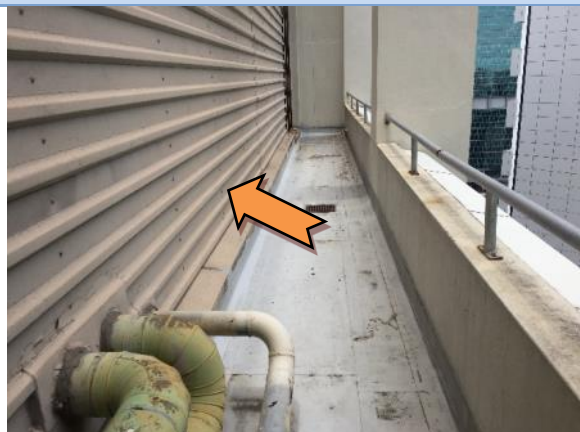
Exterior, Level 22 - Southern Elevation, Perimeter. Extends up to Level 23 - Partition Walls - Fibre Cement Sheet - Non-asbestos containing material
